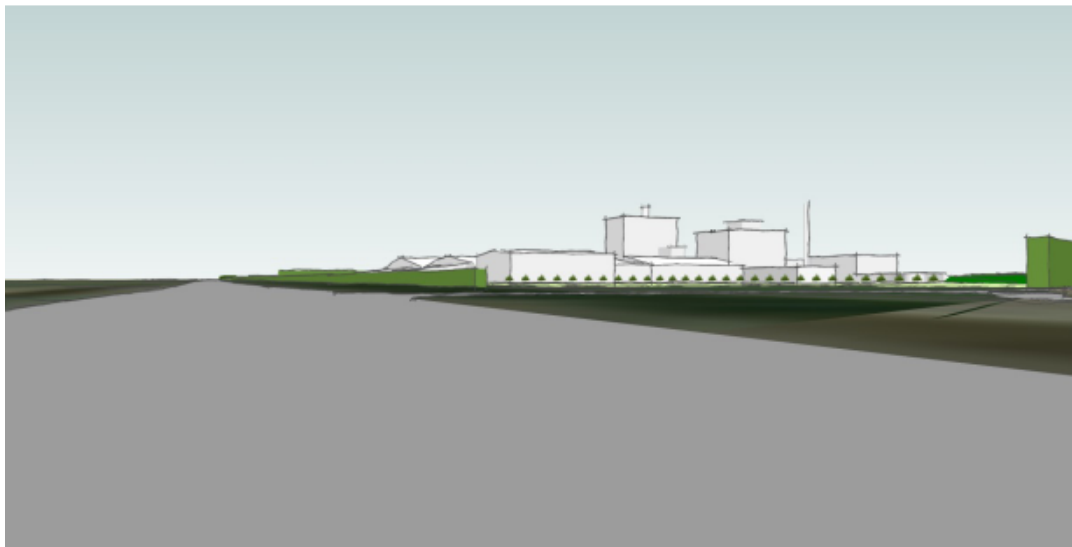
View towards the site from the SH1/Parkins Road intersection showing established planting and potential Stage 1 and 2 building development. (Note: excludes substation from view)
